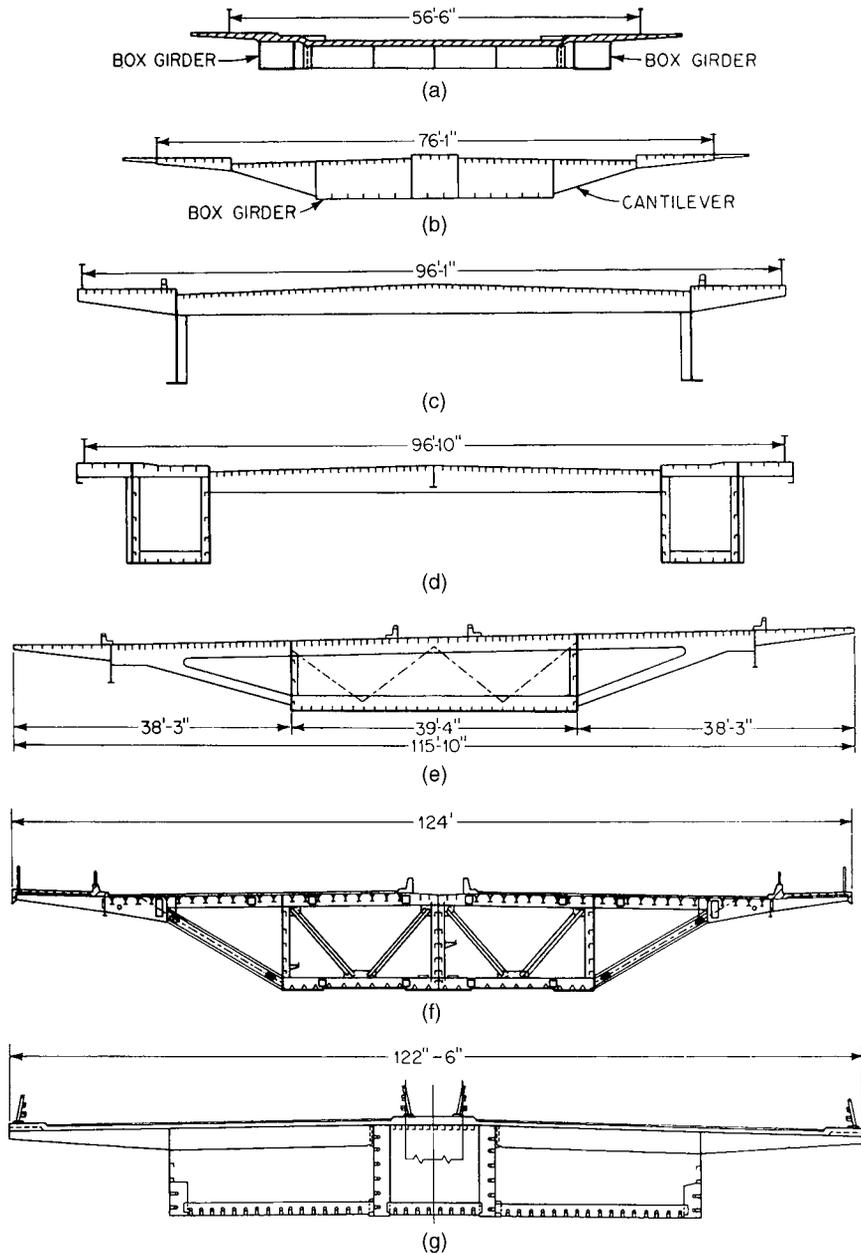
Typical cross sections of cable-stayed bridges. (a) Büchenauer Bridge with composite concrete deck and two steel box girders. (b) Julicherstrasse crossing with orthotropic-plate deck, box girder, and side cantilevers. (c) Kniebrücke with orthotropic-plate deck and two solid-web girders. (d) Severn Bridge with orthotropic-plate deck and two box girders. (e) Bridge near Maxau with orthotropic-plate deck, box girder, and side cantilevers. (f) Leverkusen Bridge with orthotropic-plate deck, box girder, and side cantilevers. (g) Lower Yarra Bridge with composite concrete deck, two box girders, and side cantilevers. (Adapted from A. Feige, "The Evolution of German Cable-Stayed Bridges—An Overall Survey," *Acier-Stahl-Steel* (English version), no. 12, December 1966, reprinted in the *AISC Journal*, July 1967.)
